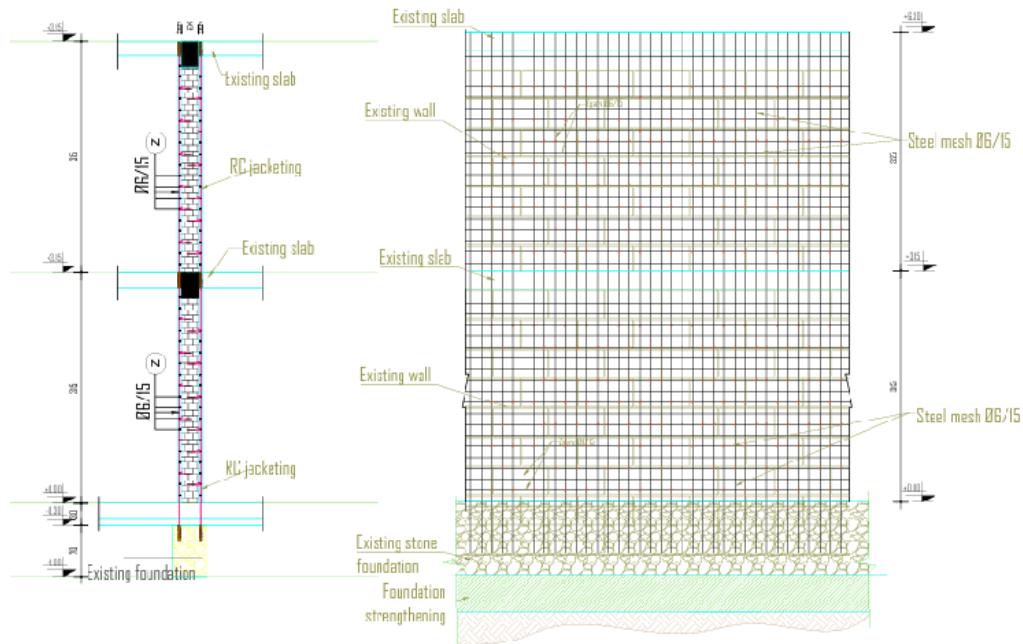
Local wall repair with RC jacketing adopted in Building 7
